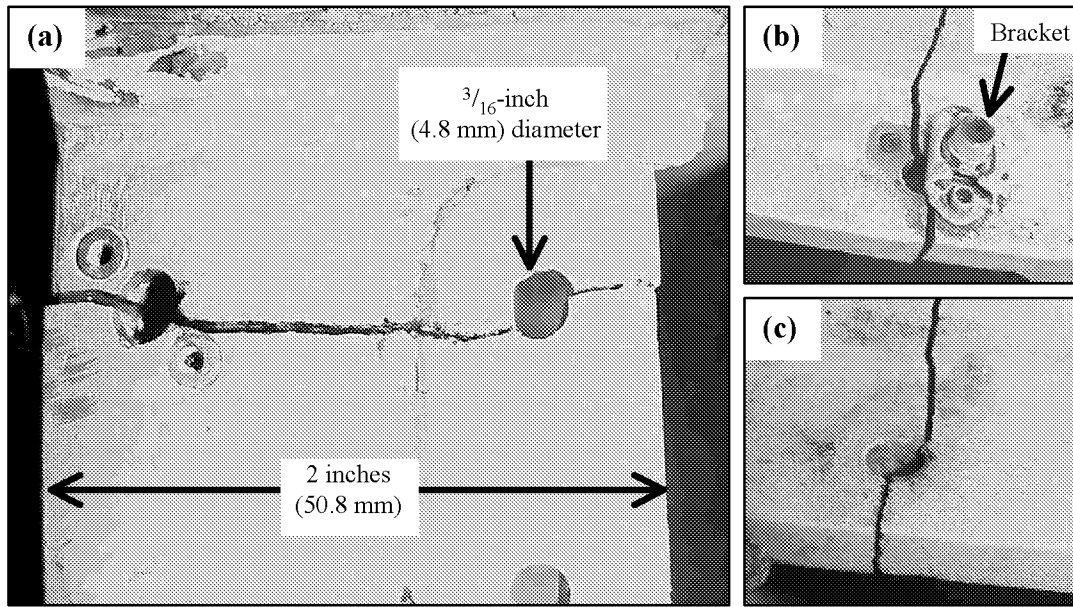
Photographs of the crack initiation region are shown. (a) A photograph of the crack intersecting two fastener holes on the top of the upper flange is shown. (b) The fastener hole on left of (a) is shown from the underside of the flange. (c) The fastener hole on right of (a) is shown from the underside of the flange.
